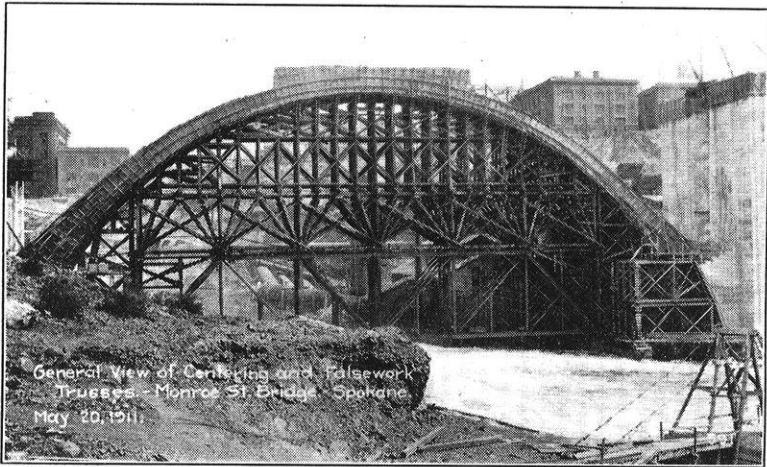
Steel Trusses and Timber Centering for 281 Foot Span.
